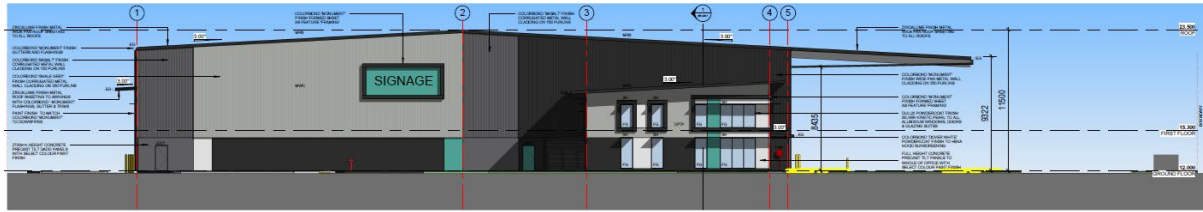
Western elevation of proposed development. (Source: Applicant's material)
